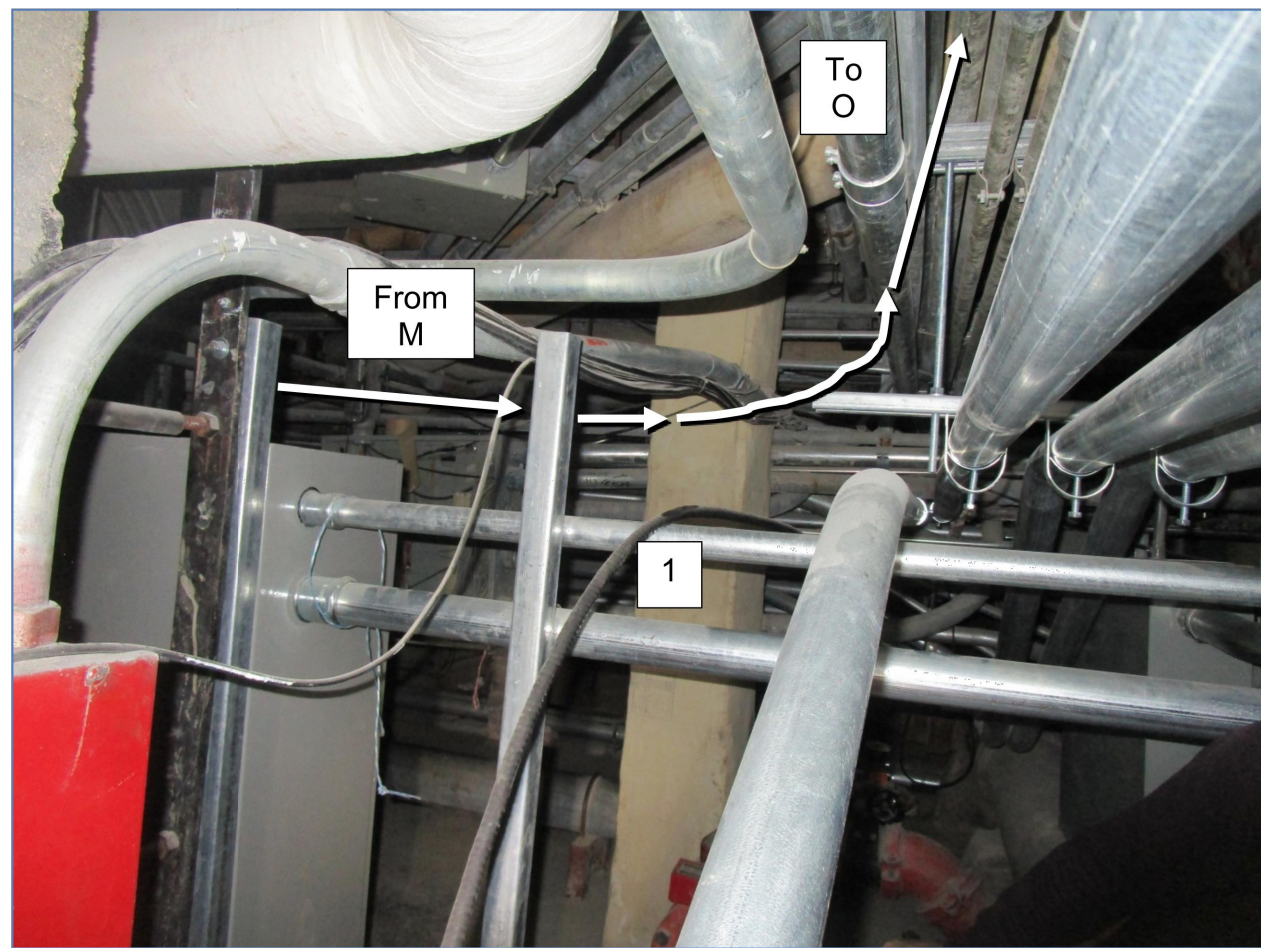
Location N, conduit routed 90 degrees from above existing junction box JB-G to alongside existing conduits
